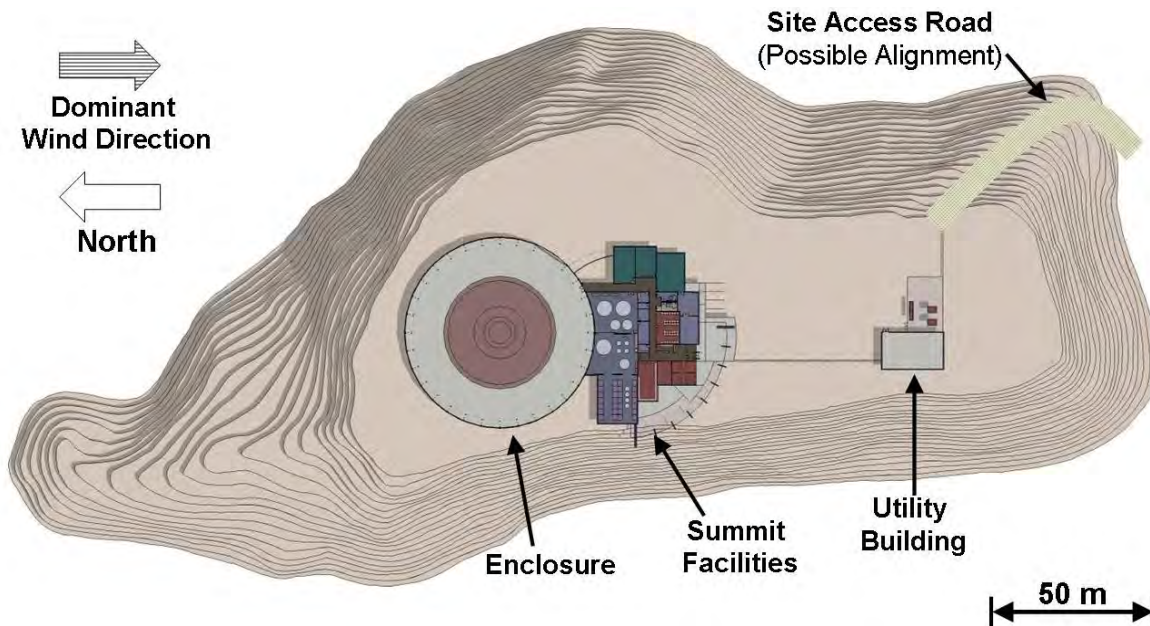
Current enclosure and summit facility layout on Armazones.
